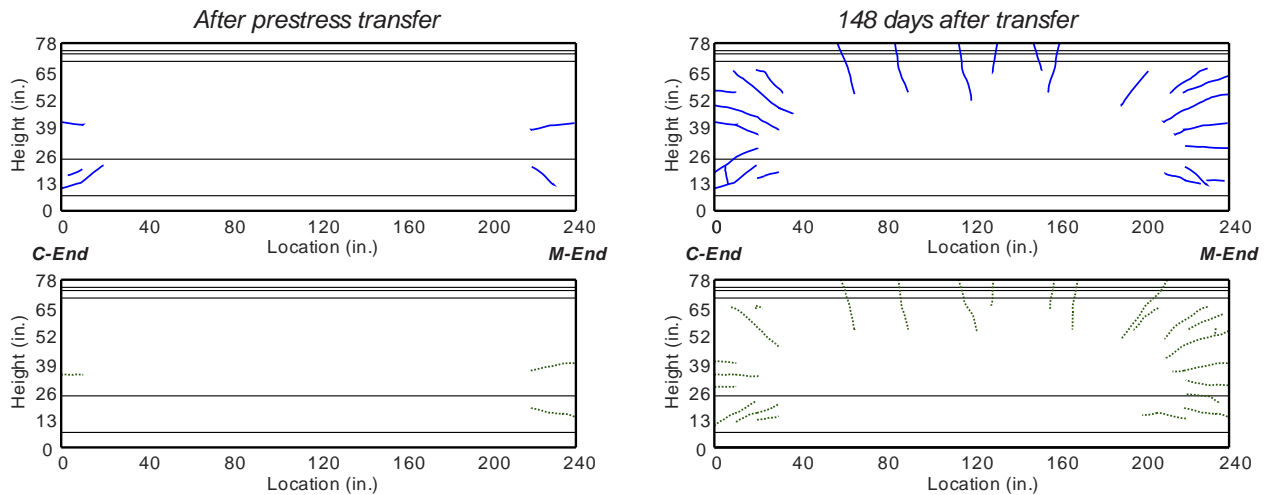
PP-50 Crack patterns shown on North face of specimen. Solid blue lines depict cracks visible on the North face and dashed green lines depict cracks visible on the South face.
